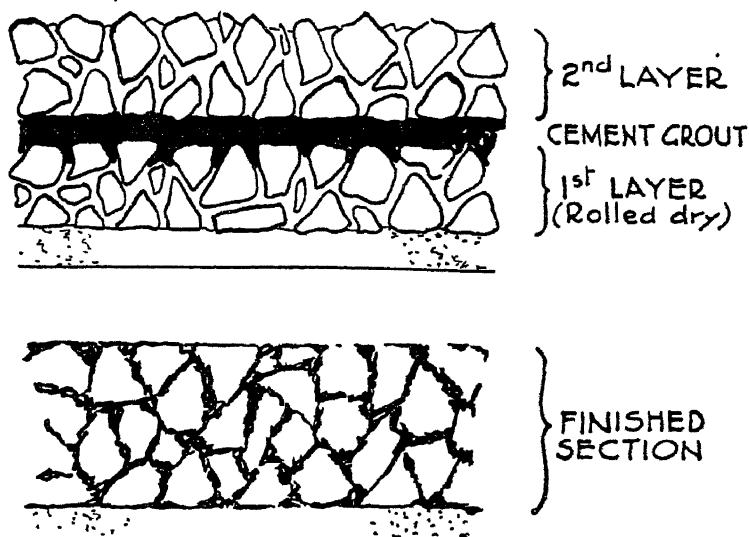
SECTION OF A TYPICAL CEMENT-BOUND ROAD (SANDWICH TYPE).
